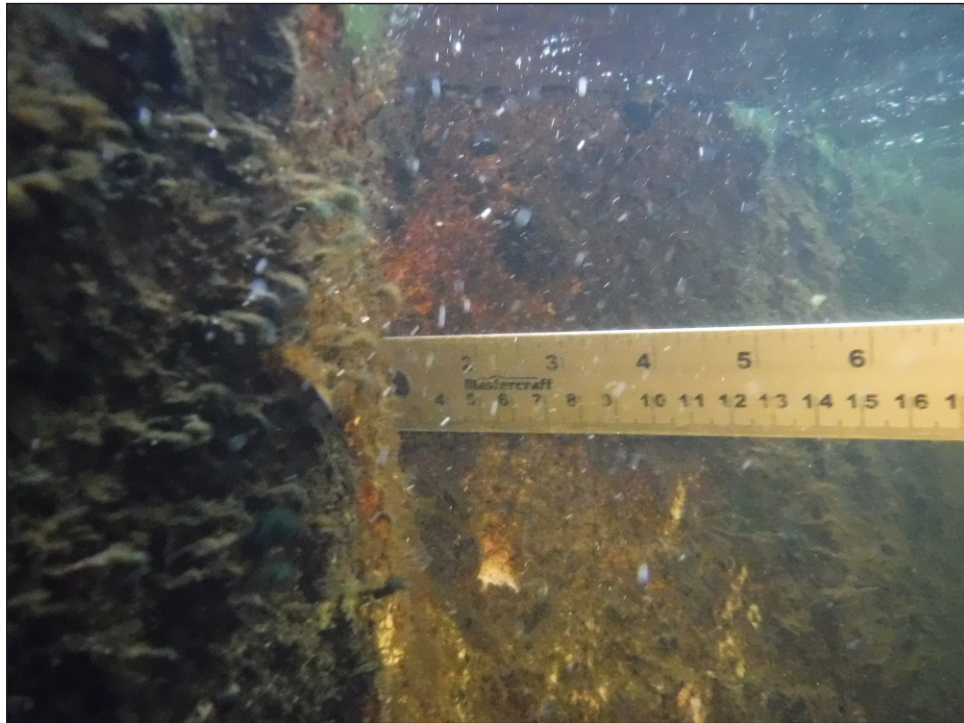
Spall on concrete blocks, west side of Rest Pier
